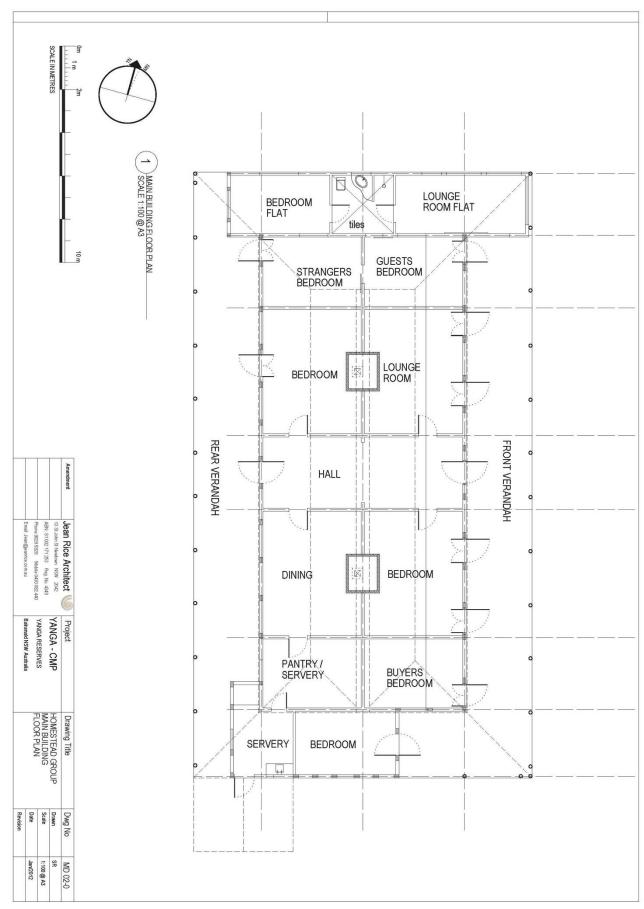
Homestead Group Main Building floor plan. Jean Rice Architect, site assessment 2009.
